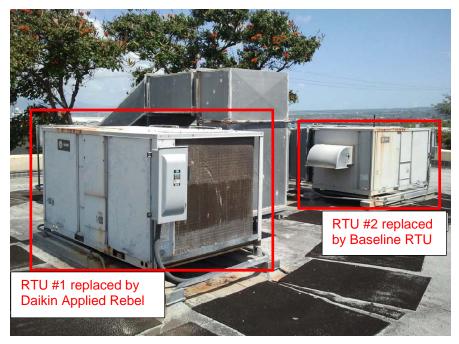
Roof of building 550 showing the existing two Trane TCH120 RTUs
